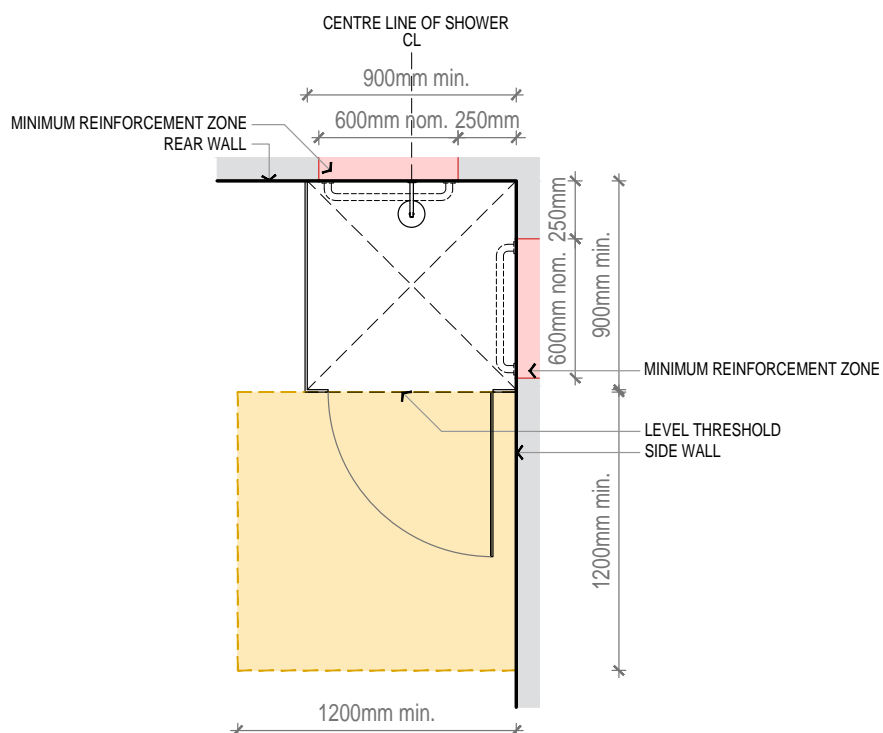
Shower wall reinforcement elevation for future grab rails
